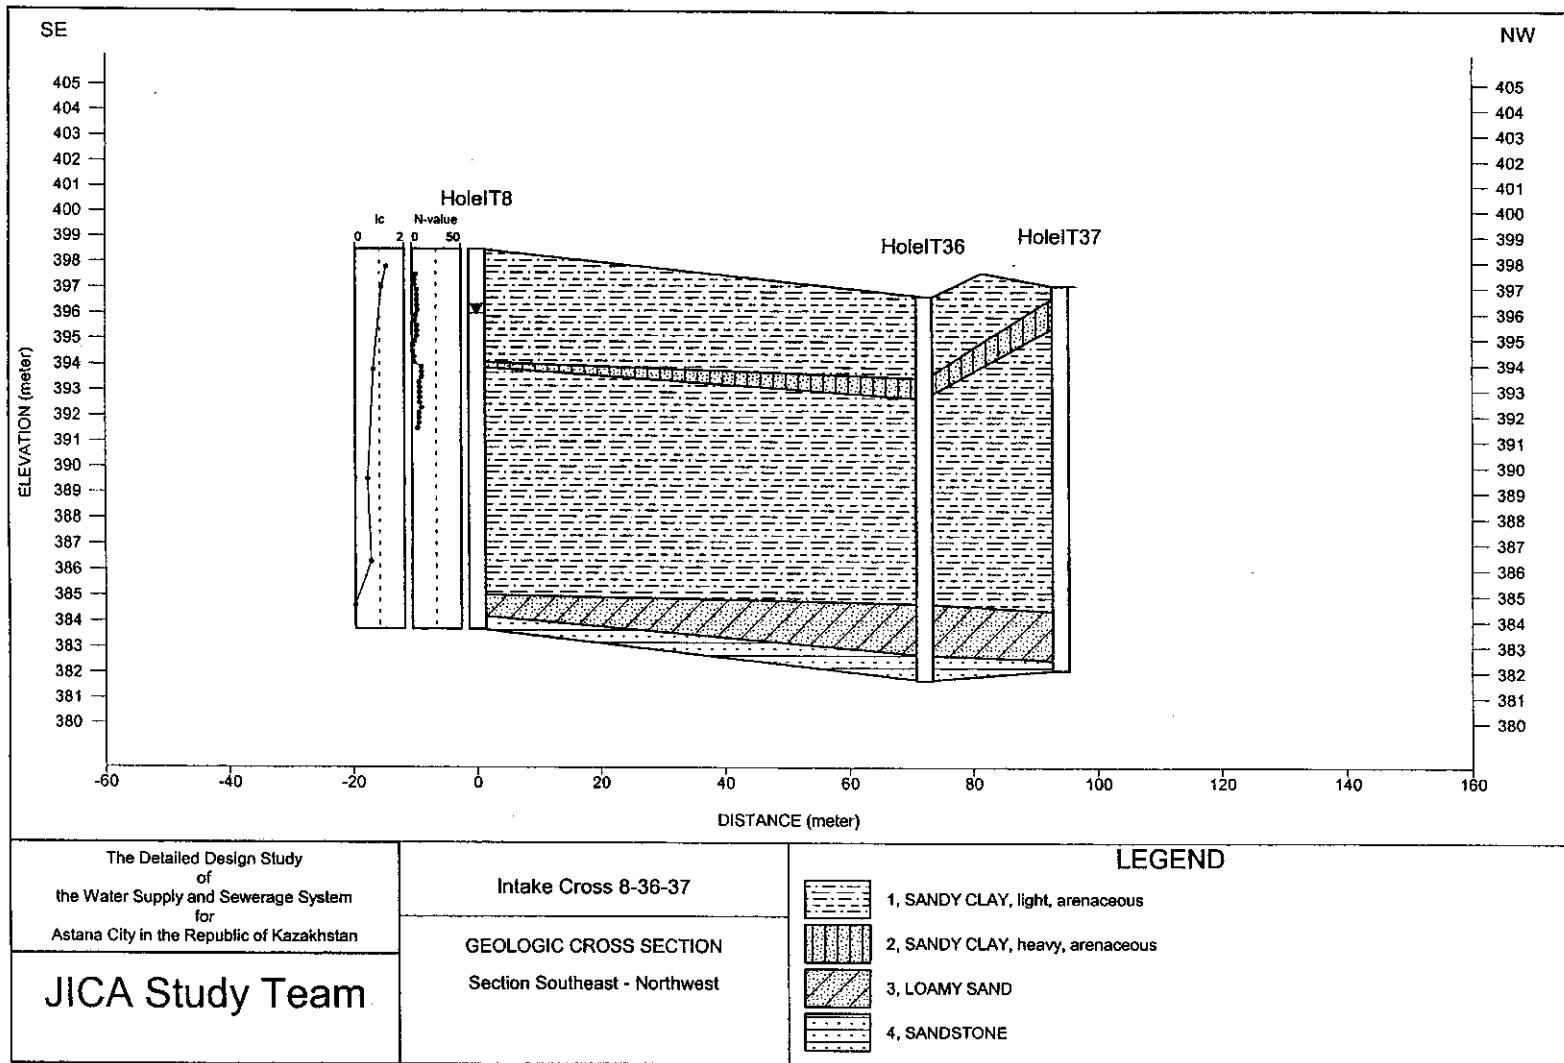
(1) Geological Cross Section at Water Intake Tower (1/3, Line No. 8-36-37)
